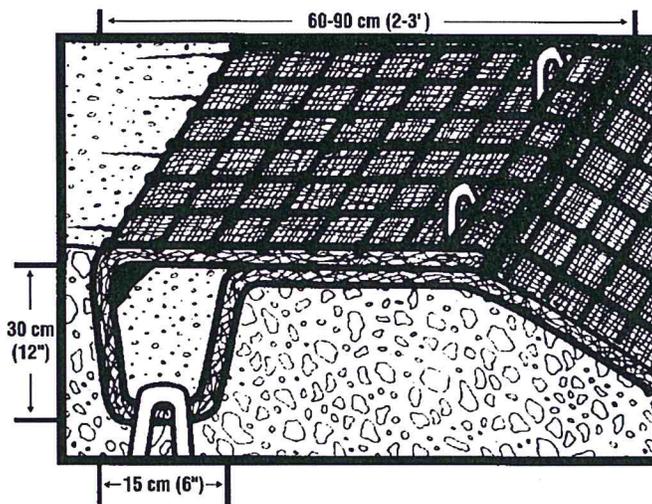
Typical Terminal Anchor Trench for Blankets and Mats
